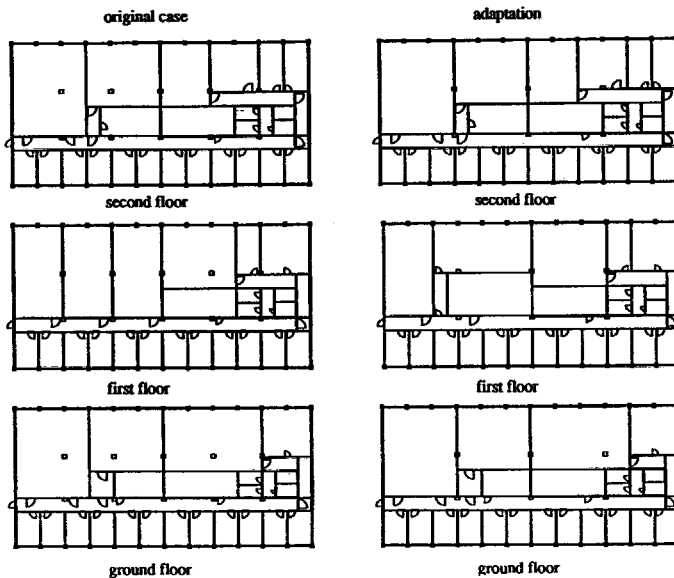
Modification and repair of a case. Left: Case before adaptation. Right: Case after architectural and structural adaptation. Note the automatic changes to the space layout and to the structural grid.
